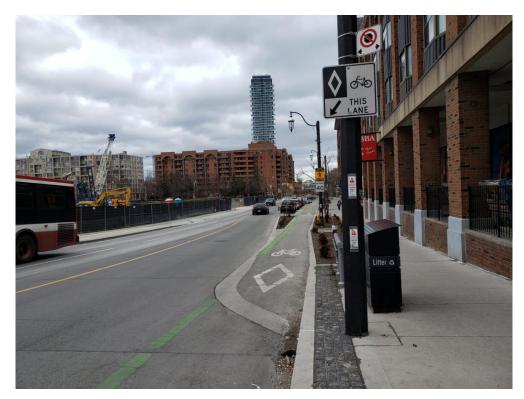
Sherbourne Street from Front Street, facing south. Part of Tunnel Routes 1 and 2 and Open Cut Route 2.
